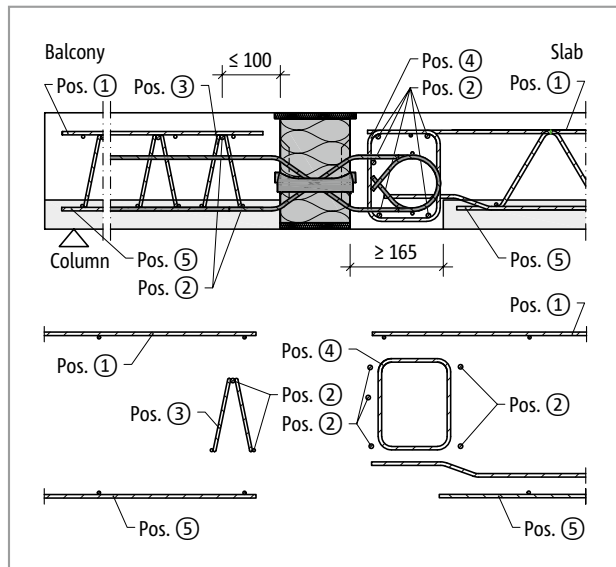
Schöck Isokorb® XT type Q-VV1 to VV4 on-site reinforcement with lattice beam
